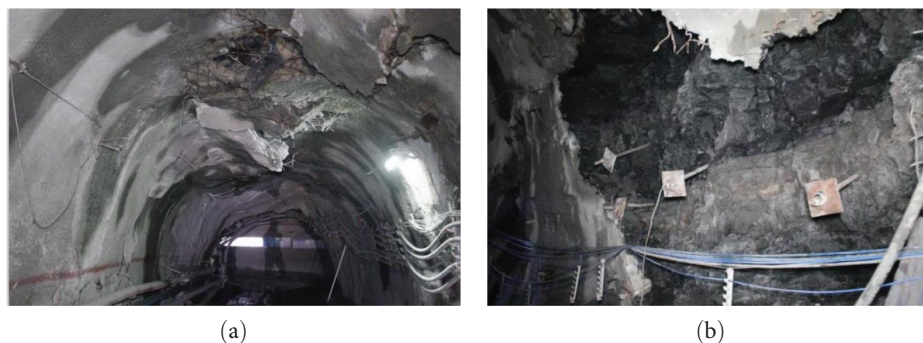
Deformation and failure of roadway under original support scheme. (a) Deformation and failure of surrounding rock and (b) Failure of support component.
